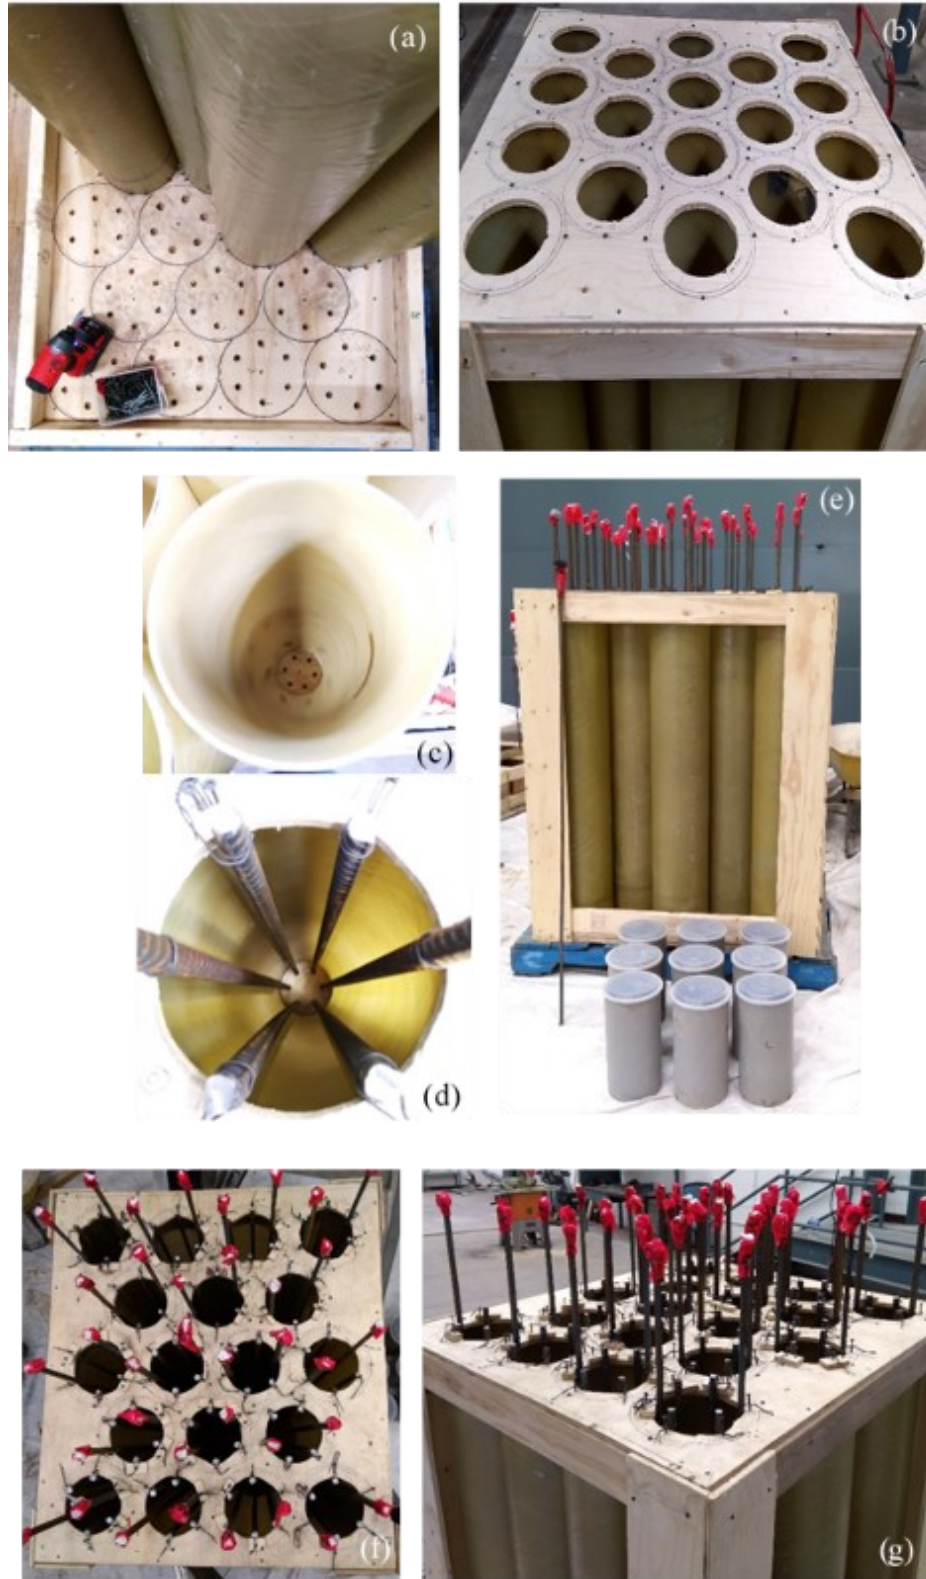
CFFT specimen fabrication: (a) Dimension layout; (b) Cage assembly; (c) Specimen before rebar installation; (d) Fixing of steel rebars; (e) Full assembly; (f) Top view of the full assembly; (g) Assembled formwork before concreting
